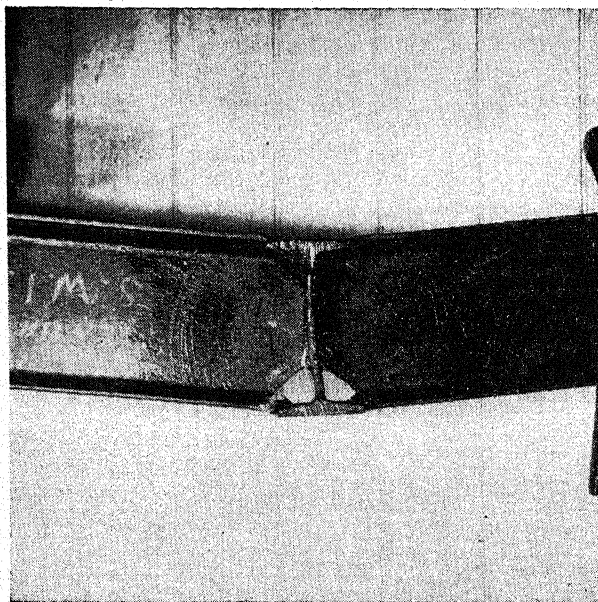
View after test of beam. Failure occurred through buckling of compression flange at load of 23.5 tons.
